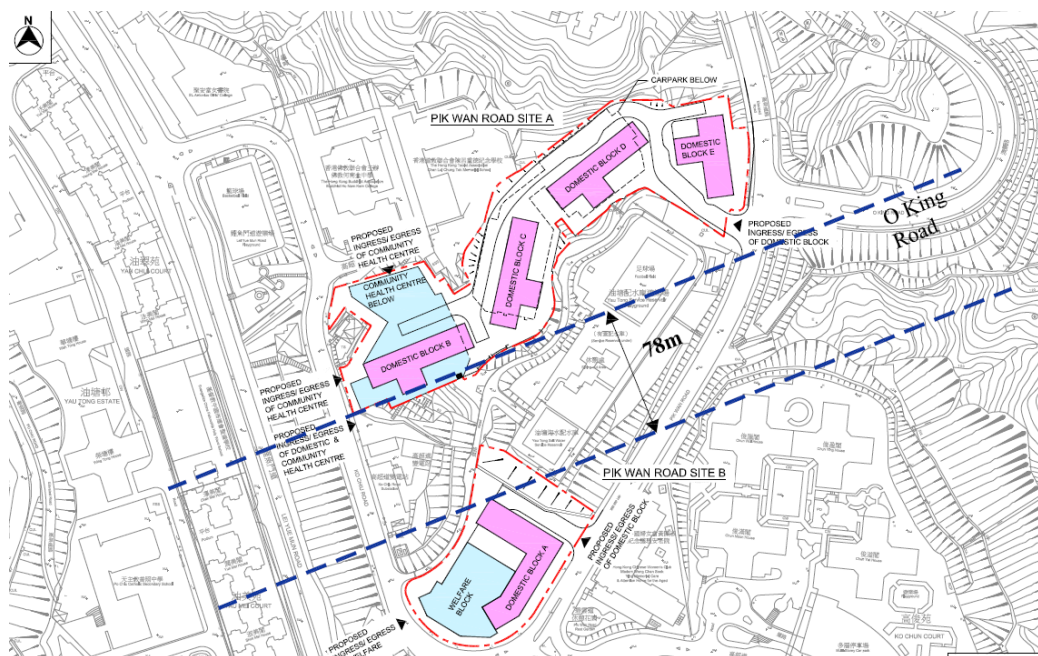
Air Path between the Proposed Development and Pik Wan Road Site A
